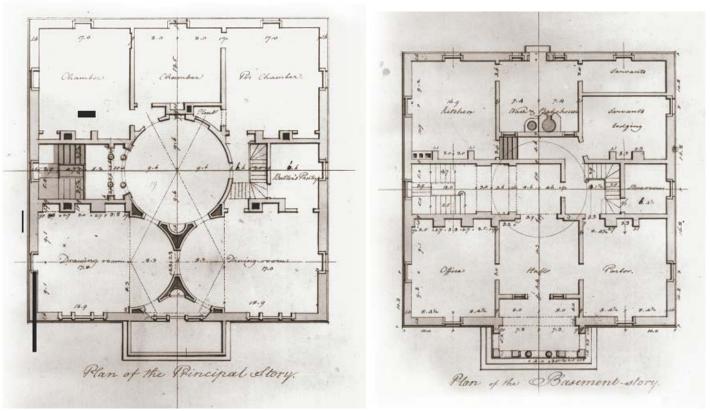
Upper floor plan and first floor (Basement-story) plan.
